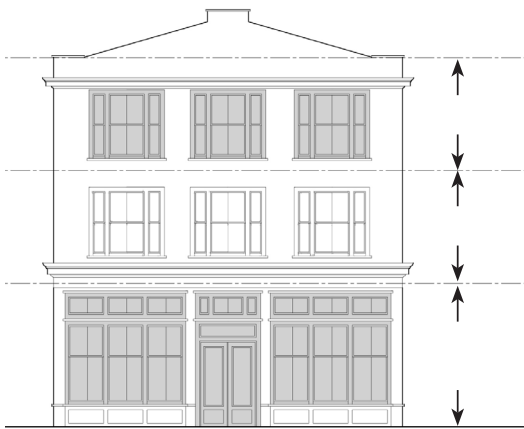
FAÇADE TRANSPARENCY REQUIREMENTS FOR BUILDINGS WITH SHOPFRONT.
